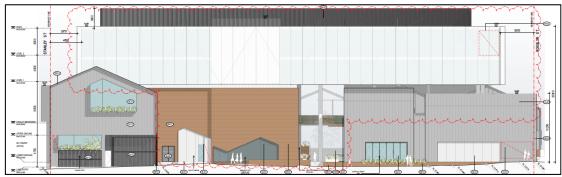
South-west Elevation (Drawing No. TP02.03)
